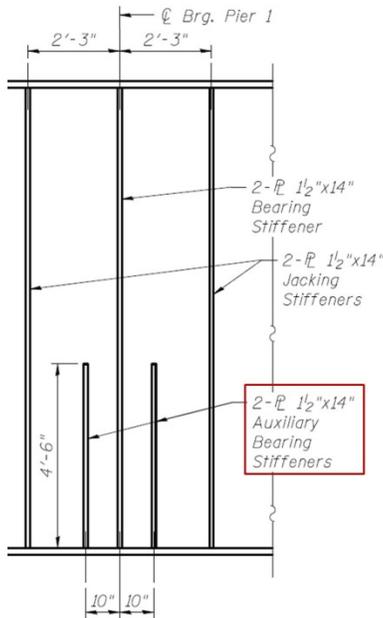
Auxiliary Bearing Stiffeners and Future Jacking Stiffeners at Pier 1 (shown) and Pier 4 (similar)
